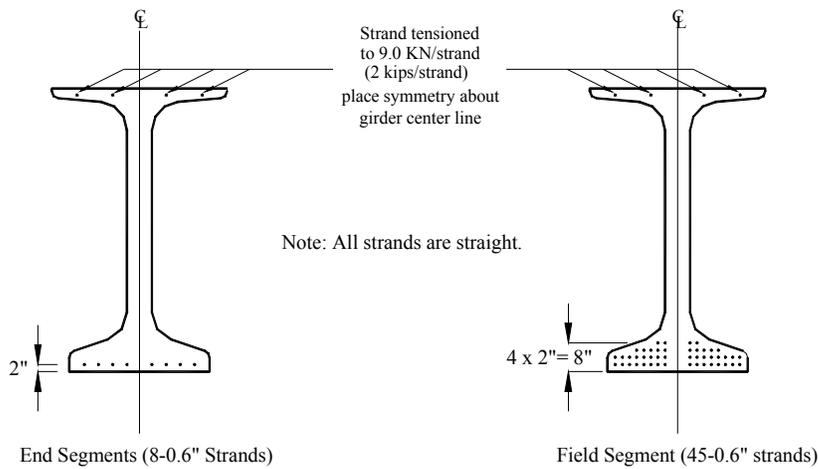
Pretensioning Scheme of the 198th – Skyline Drive Bridge
